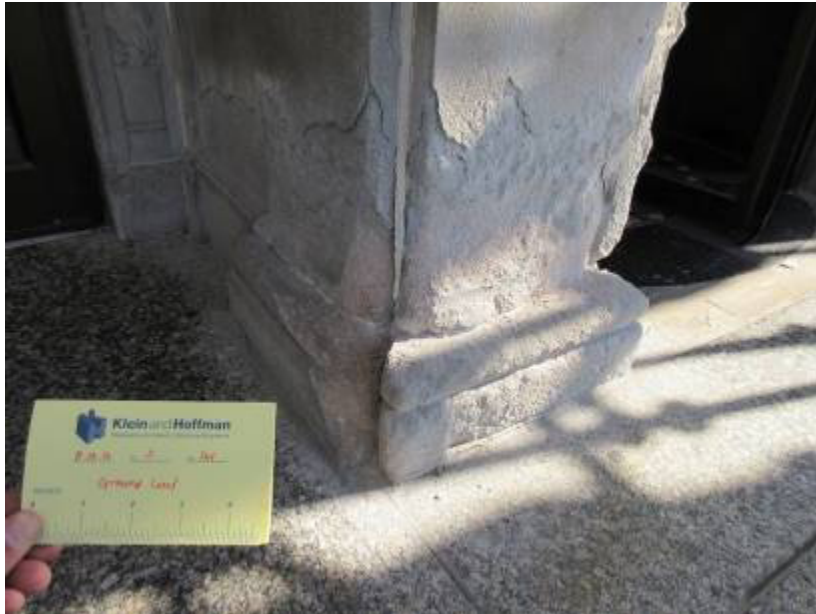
Showing significant deterioration of stonework at south entrance.
